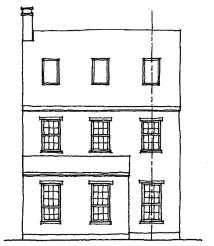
While skylights are not recommended on primary facades, they may be added to secondary facades if they are incorporated into the overall pattern of doors and windows. Skylights should align vertically with windows in the wall below.
